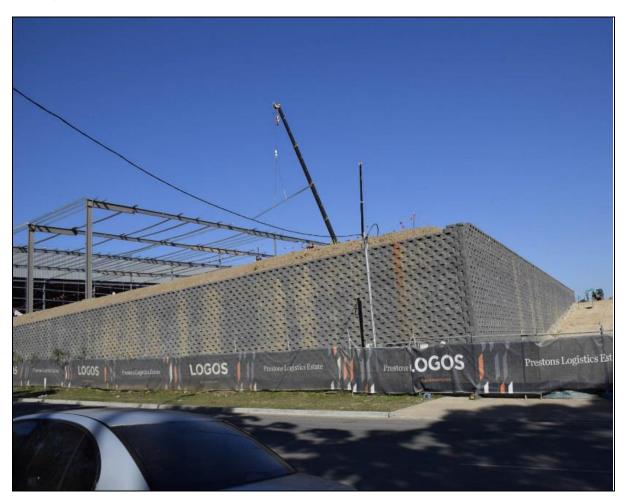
& 4 – 5-35 Yarrunga St – solid reinforced elevated retaining wall on boundary.
